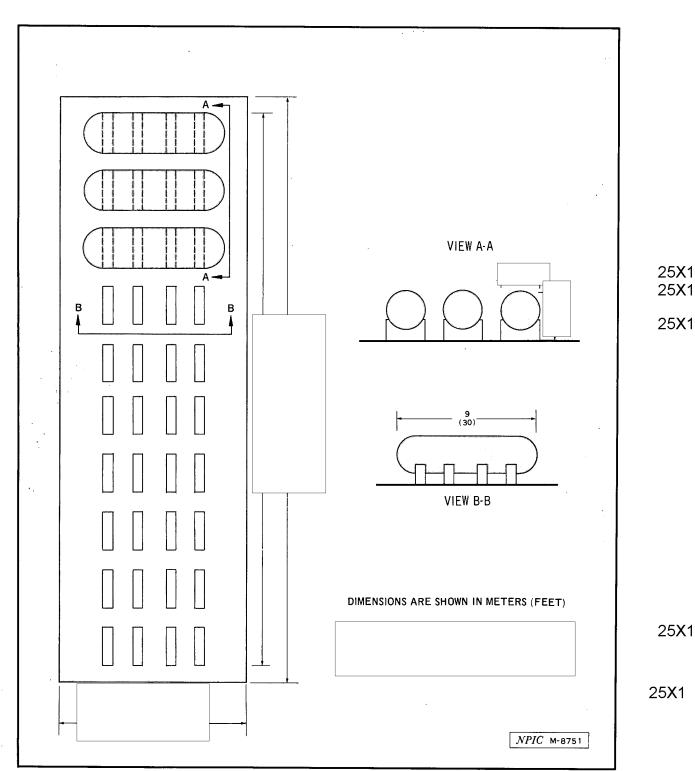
LINE DRAWING OF TYPICAL CRADLE UNIT AND TANK CRADLE
